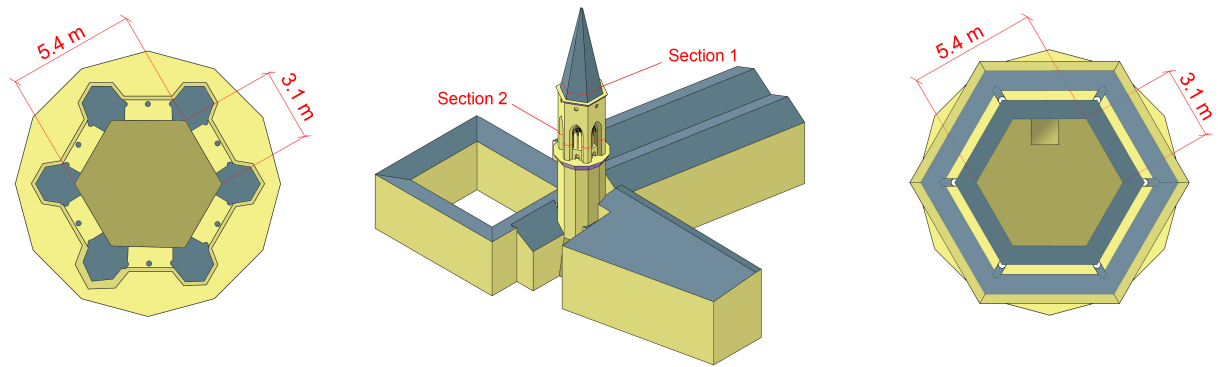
Geometrical survey of the bell-tower: tri-dimensional CAD model of the bell-tower, the surrounding buildings of the Basilica and the Abbey, with details of the plans at a level of 29.1m (left) and 40.8m (right) high.
